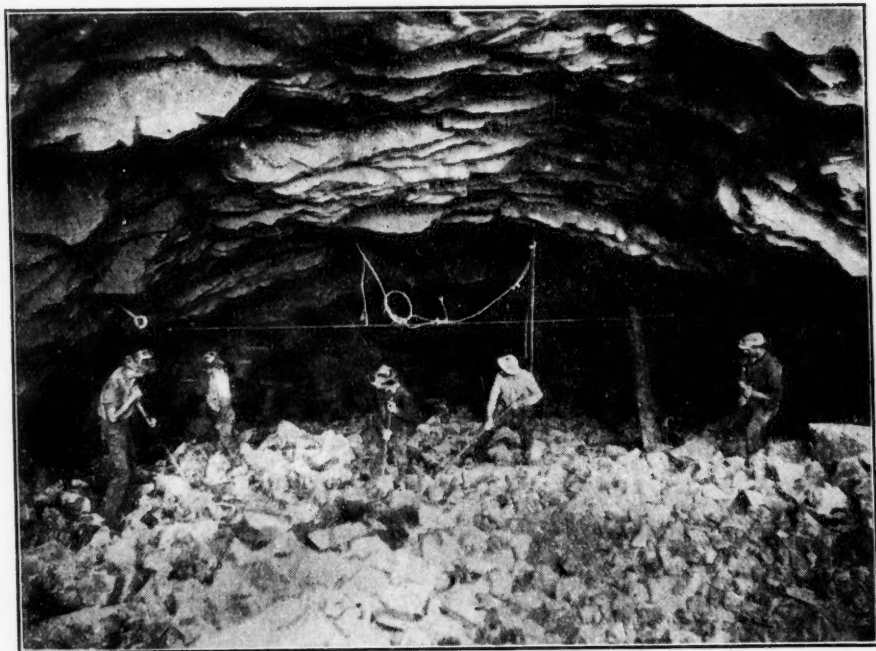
SOLID ROCK, OR TRAP-ROCK FORMATION, AT NEW JERSEY ANCHORAGE.
